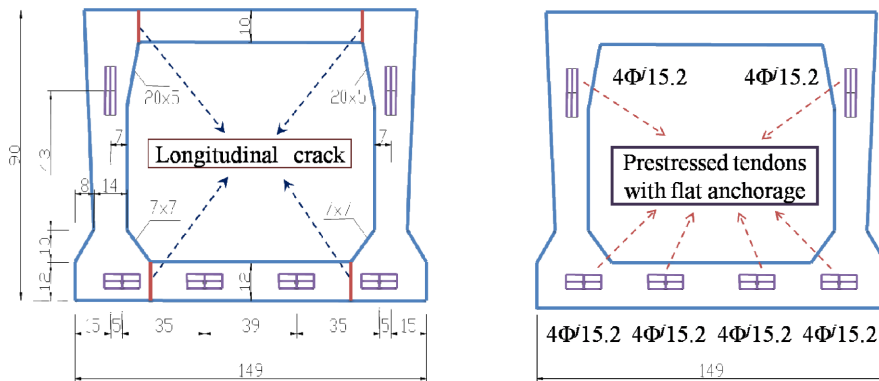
Anchor end section and longitudinal crack of slab girders with flat anchorage system (unit: cm)
